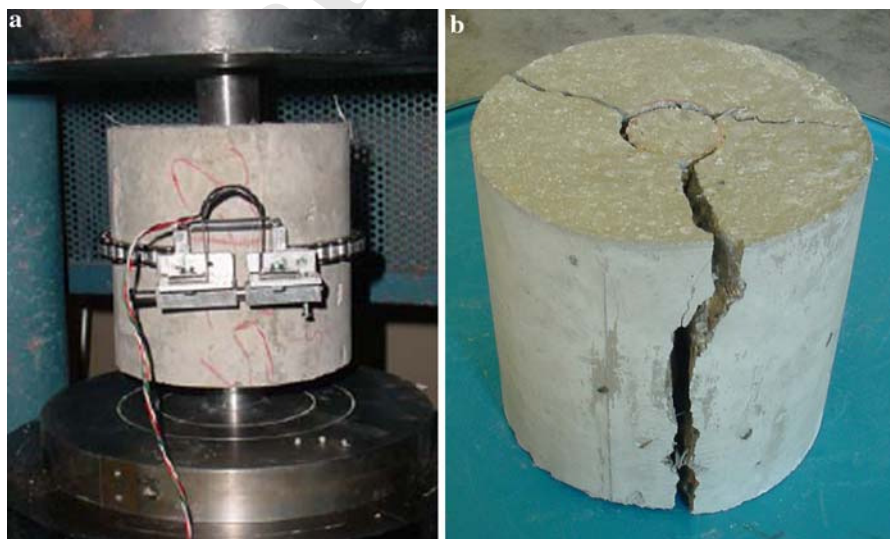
Specimen placed on the press ready to be tested (a) and the specimen after testing (b)
